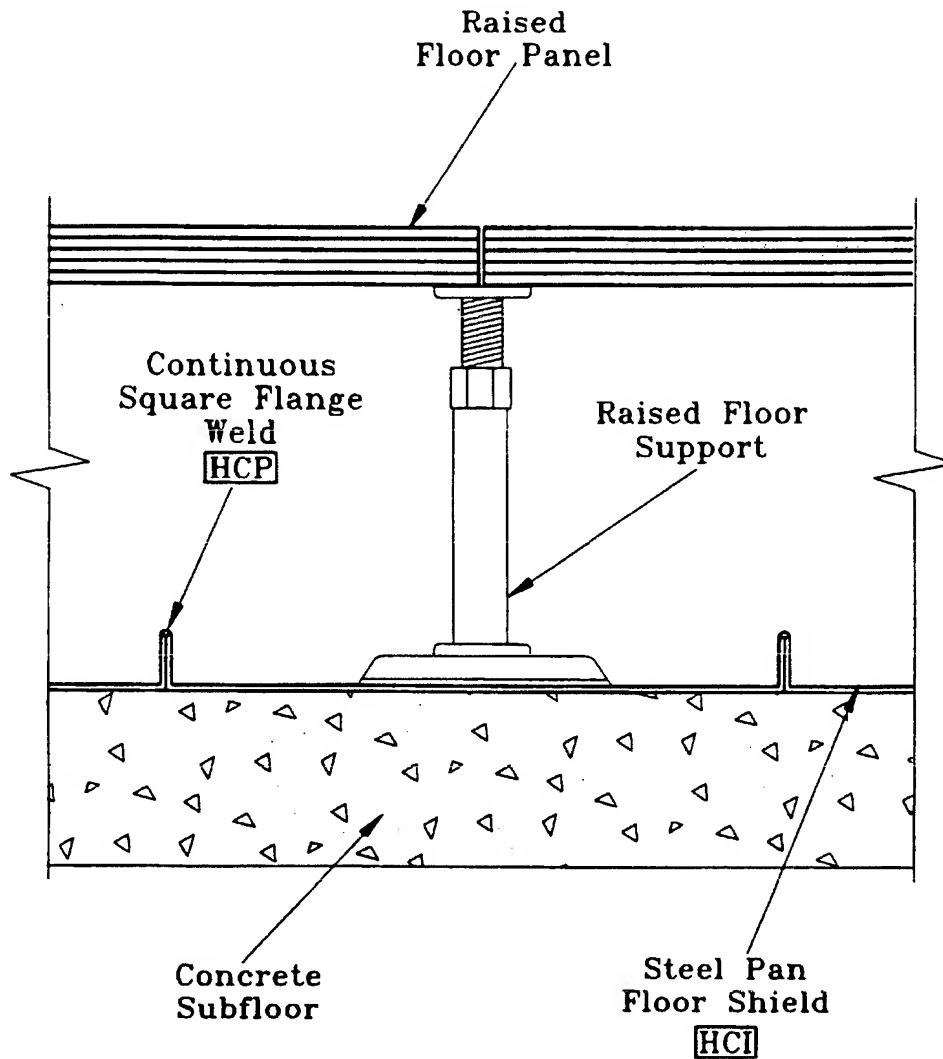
Pan-welded floor shield under raised floor.
